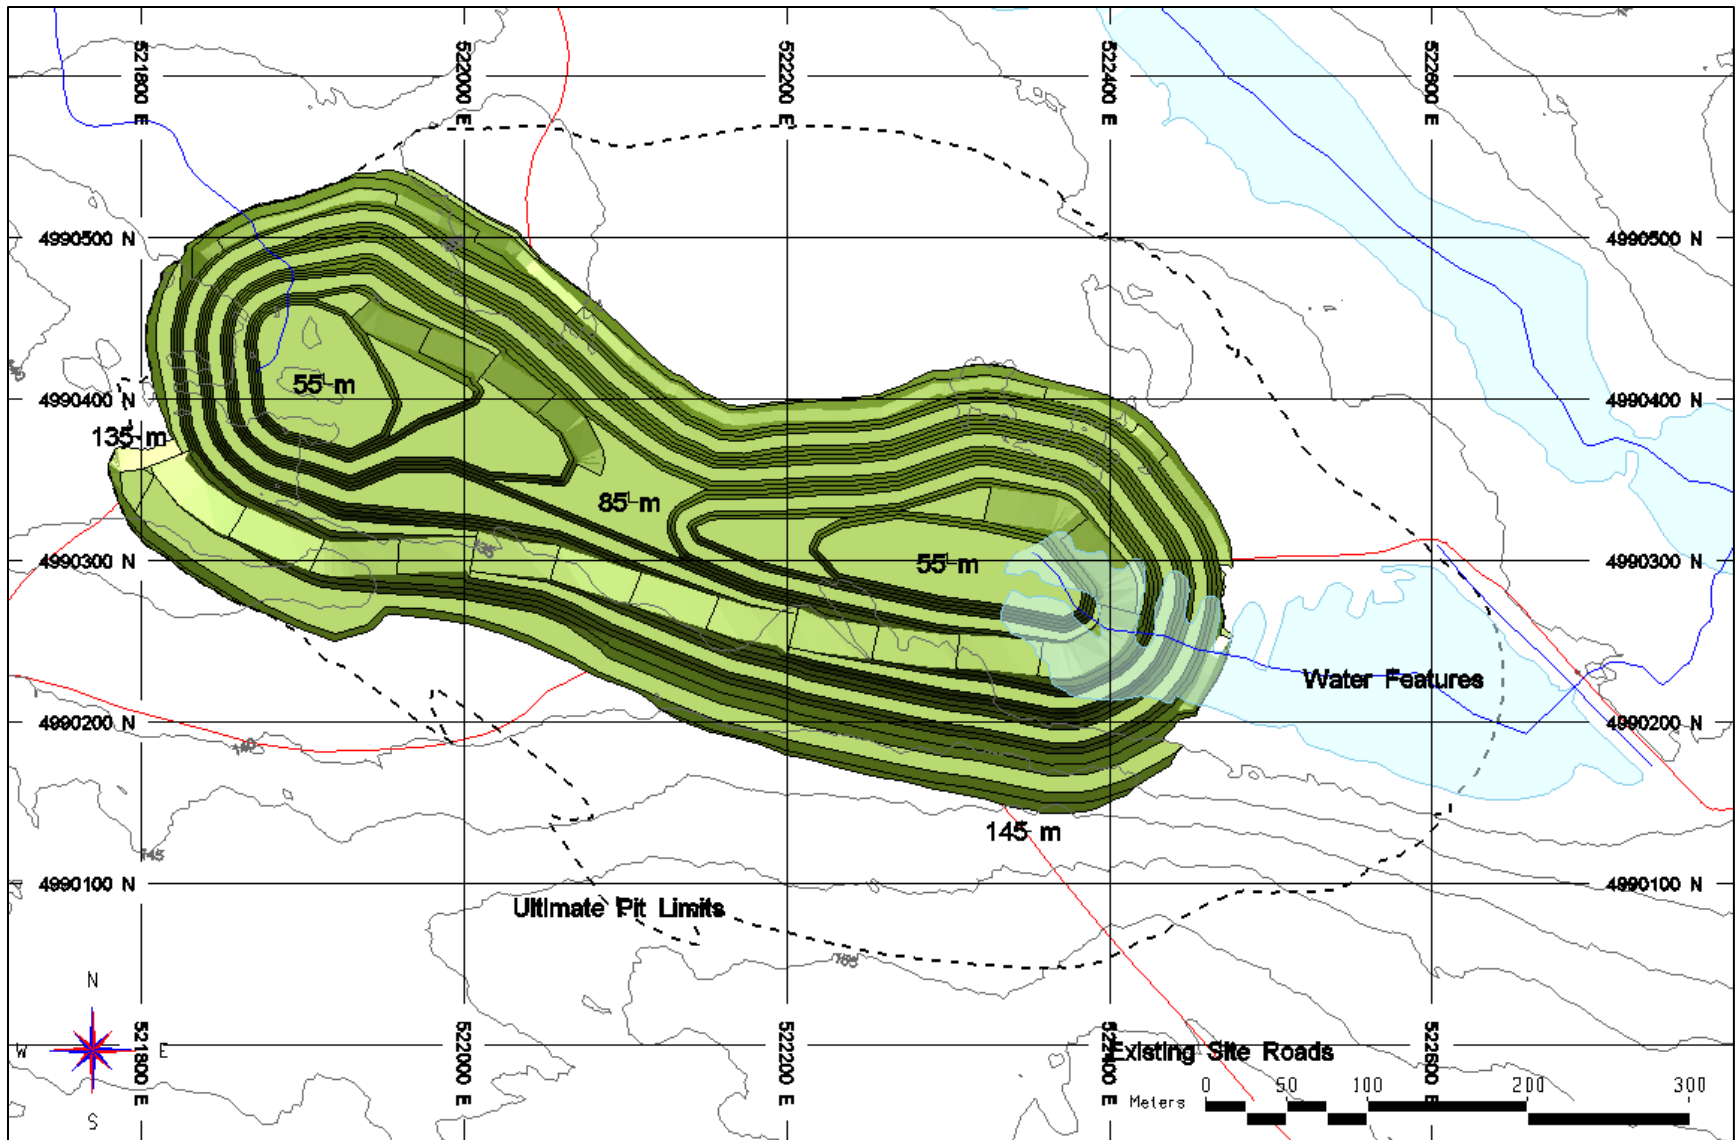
Phase 1 Detailed Pit Design, P611, Plan View (not for construction)
